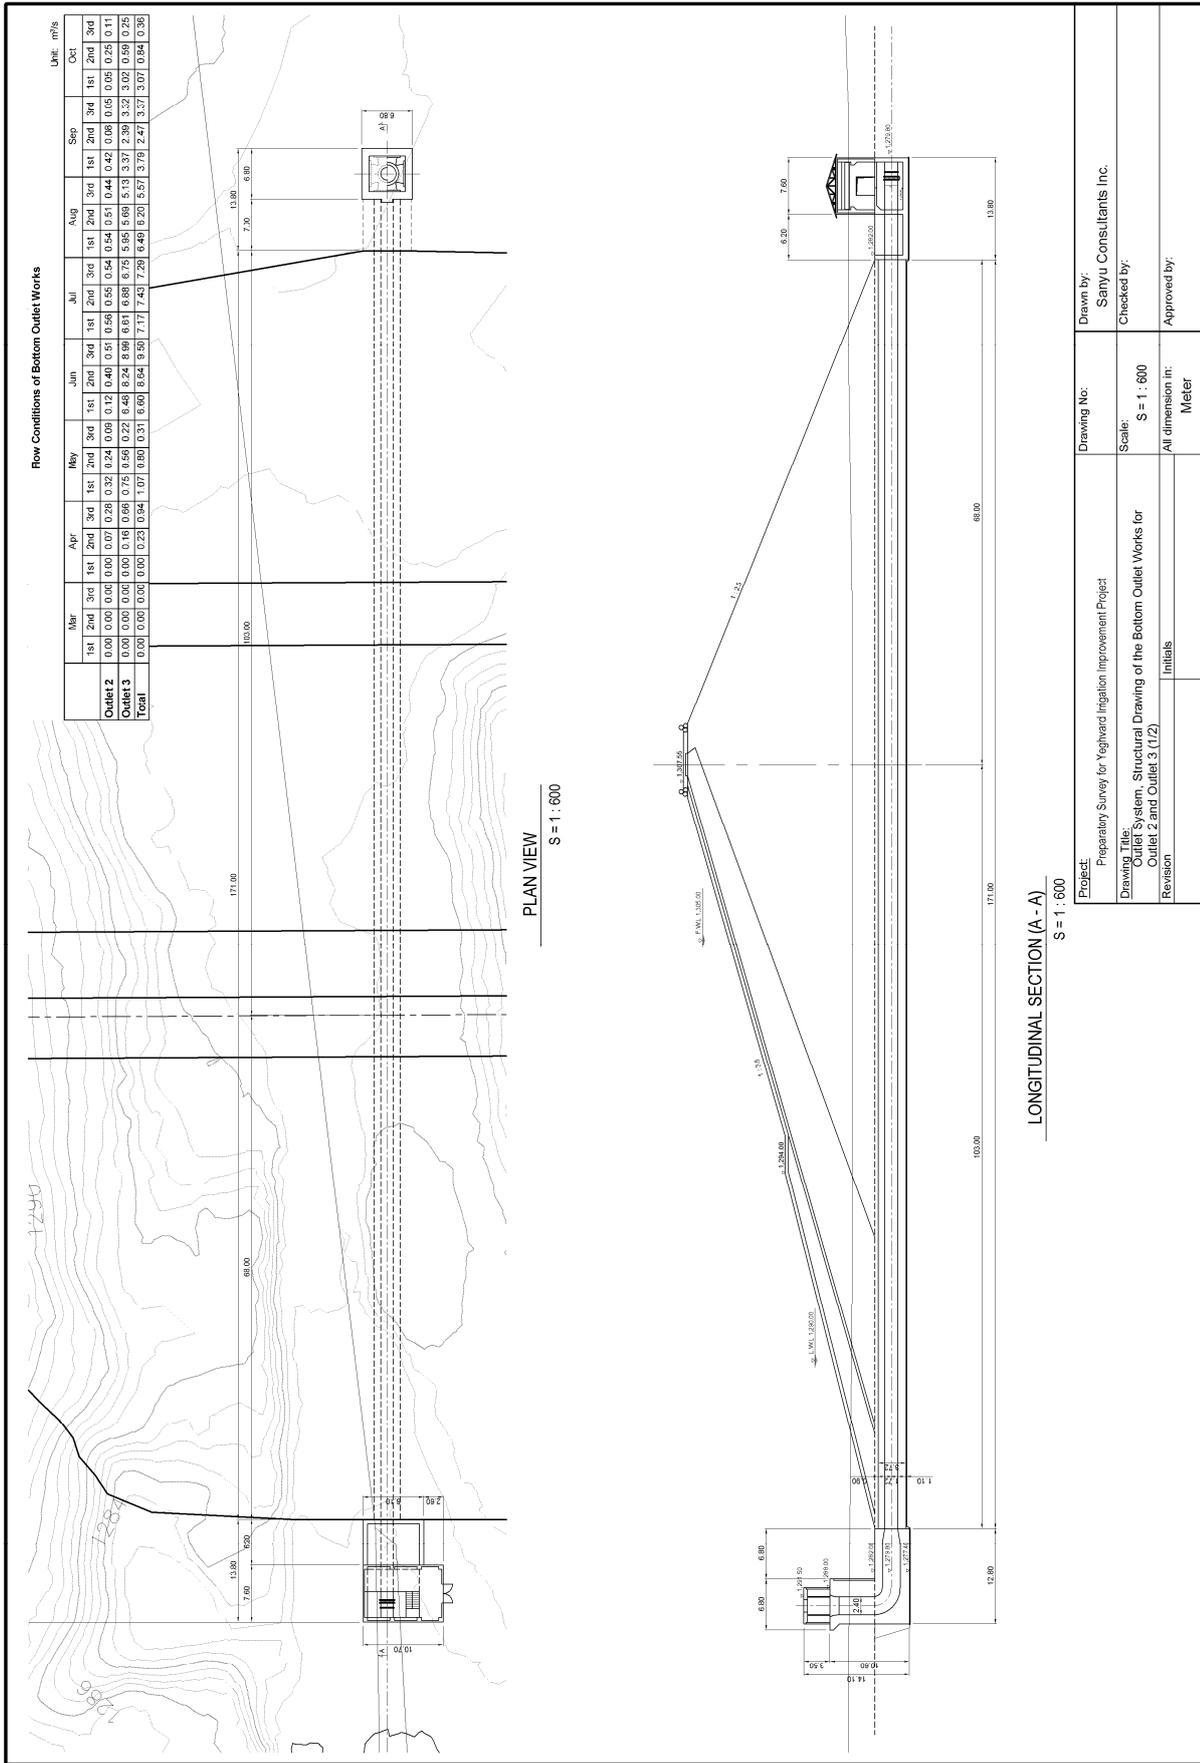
Structural Drawing of the Bottom Outlet Works
